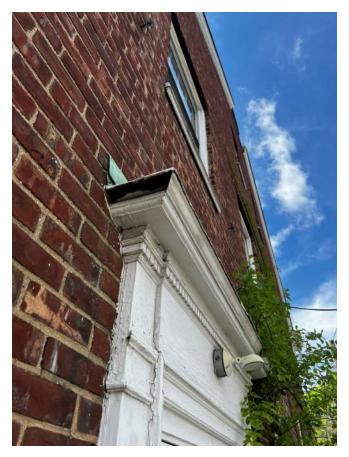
IMG_1049 - East Façade - deterioration of wood trim and missing pieces.
